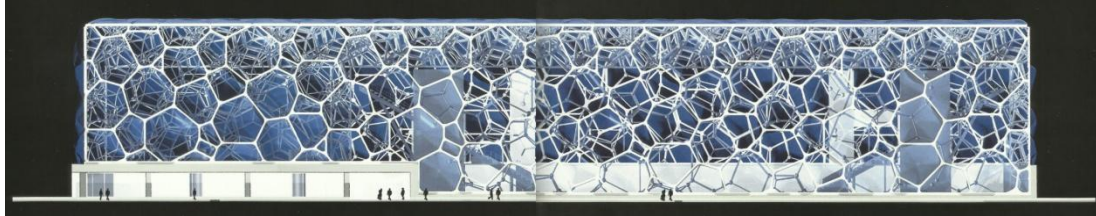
38. Elevation of the space frame structure, The Beijing National Swimming Center, Beijing, China, PTW Architects (Source: Burry, 2010)
